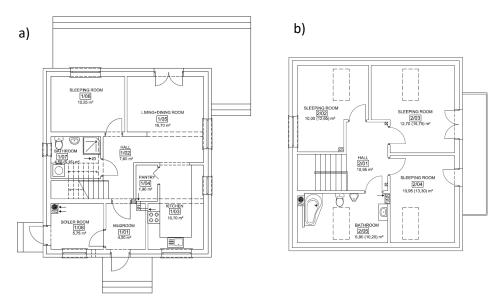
Analysed building layout: a) first floor, b) habitable attic
